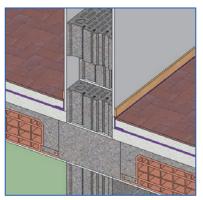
Typical Italian monolithic wall with expanded clay and concrete blocks.
